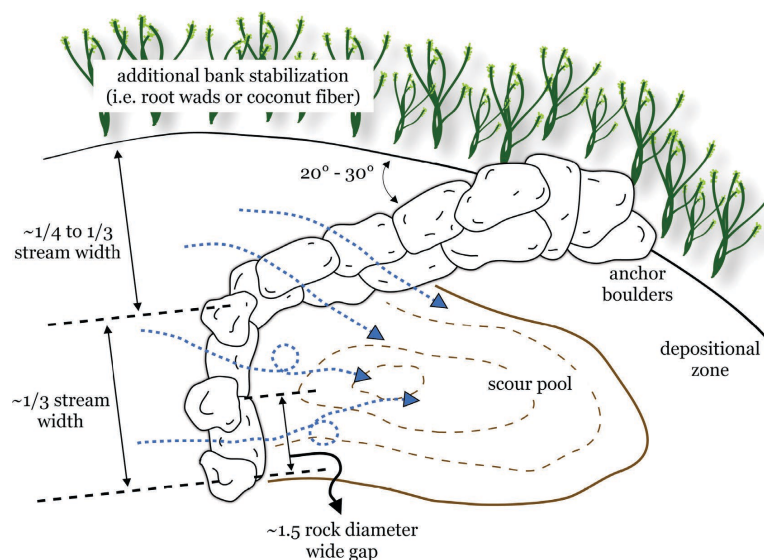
Typical J-hook vane installation (after Rosgen, 2006).
